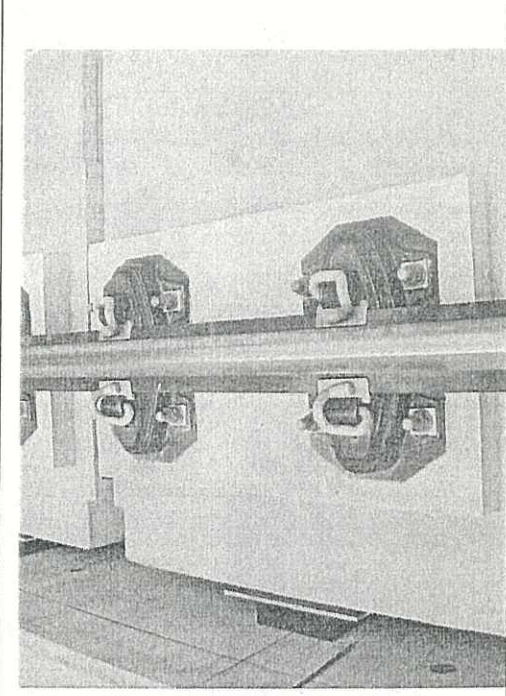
Baseplate of Floating Slab at Siu Hong Station
